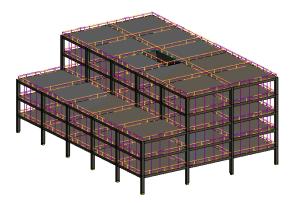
Structural BIM model designed for the BIM modelling workshop in reinforced concrete structures.
